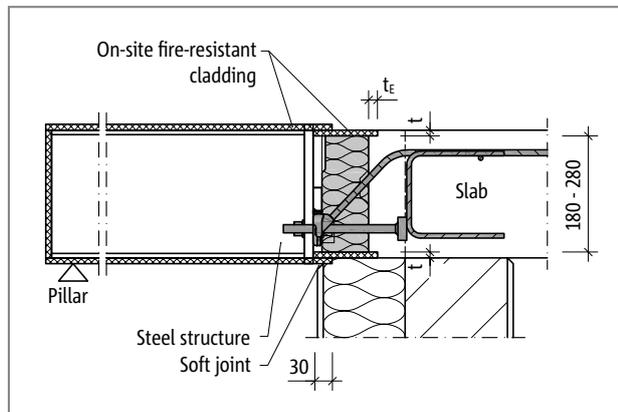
Schöck Isokorb® T type SQ: on site fire-resistant cladding T type SQ and steel structure; cross-section
